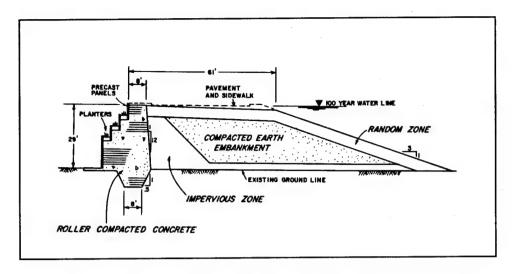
Typical cross section, Northloop Detection Dams (from Reeves and Yates 1985)
